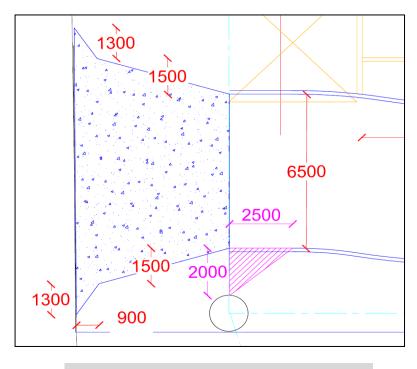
PROPOSED ACCESS ARRANGEMENTS
